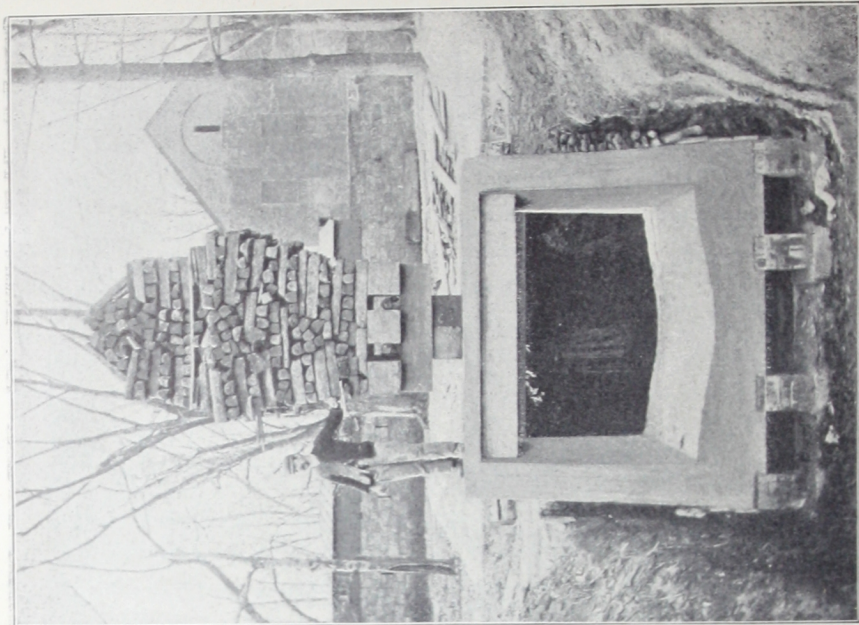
PLATE VIII. TEST SECTION OF SEWER. SPAN, 8 FEET.
